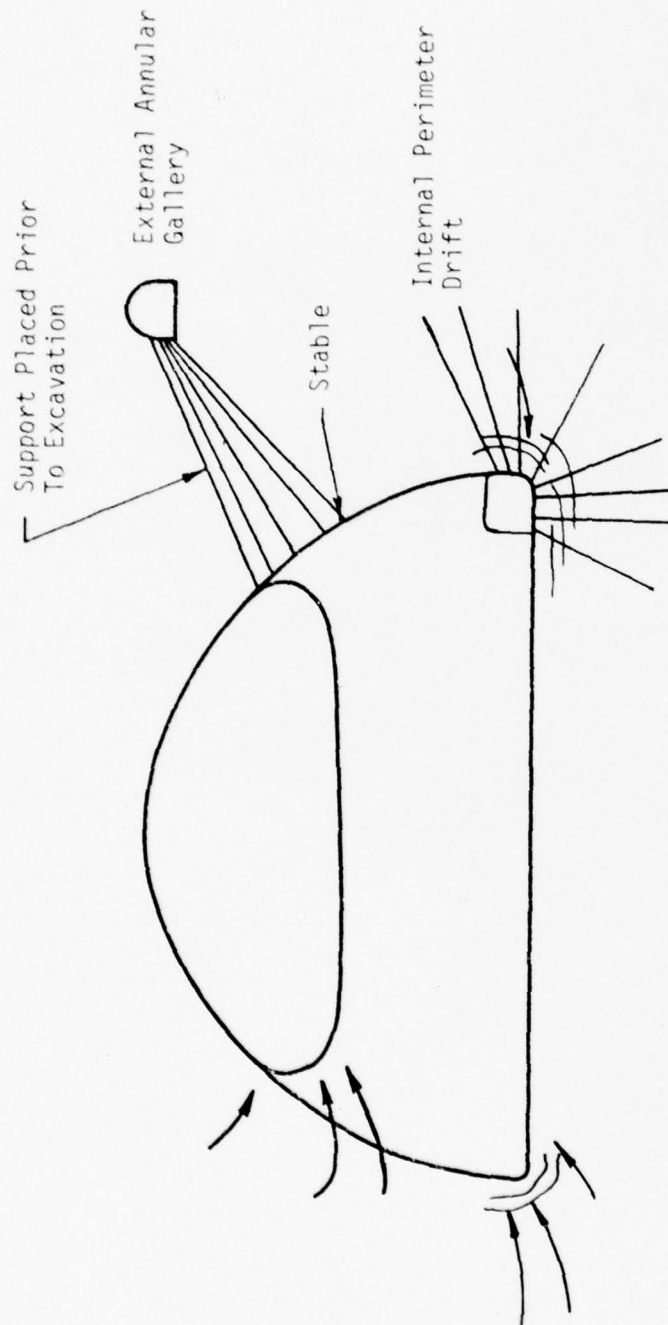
PRE-SUPPORTING OF ROCK MASS TO LIMIT INWARD MOVEMENT AND FAILURE AT BASE OF EXCAVATION
